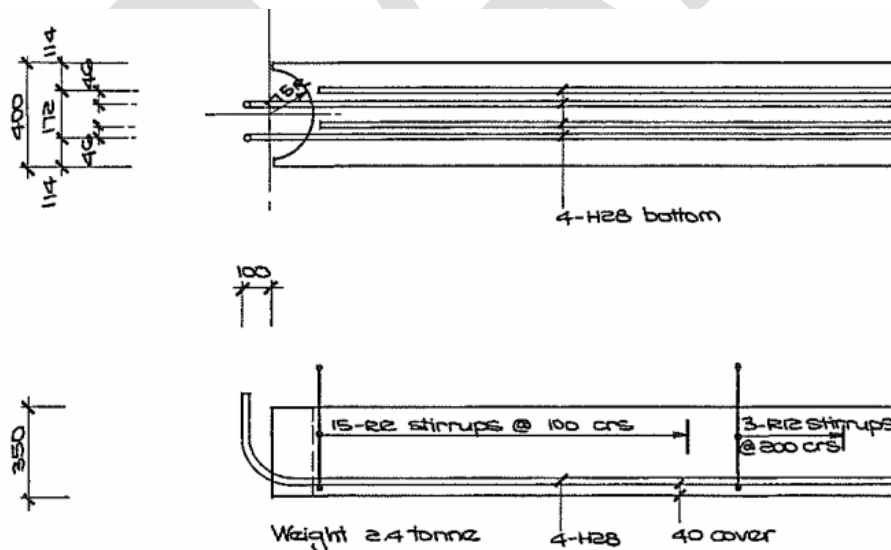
CTV building hook detail (Design Engineer 1986b)
